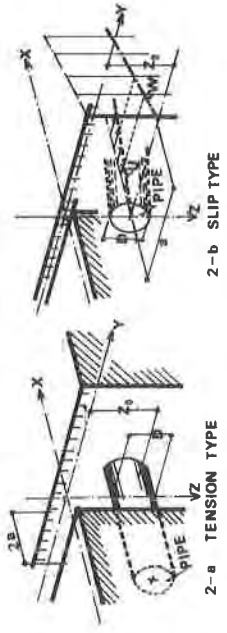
SOIL CRACK AND PIPE ARRANGEMENT
